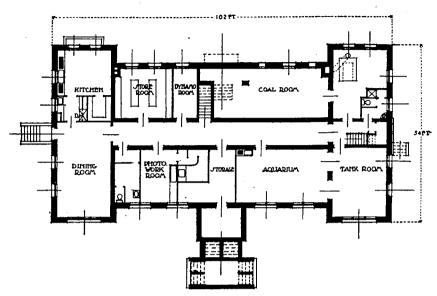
The biological laboratory, ground floor plan: D, ice box.
